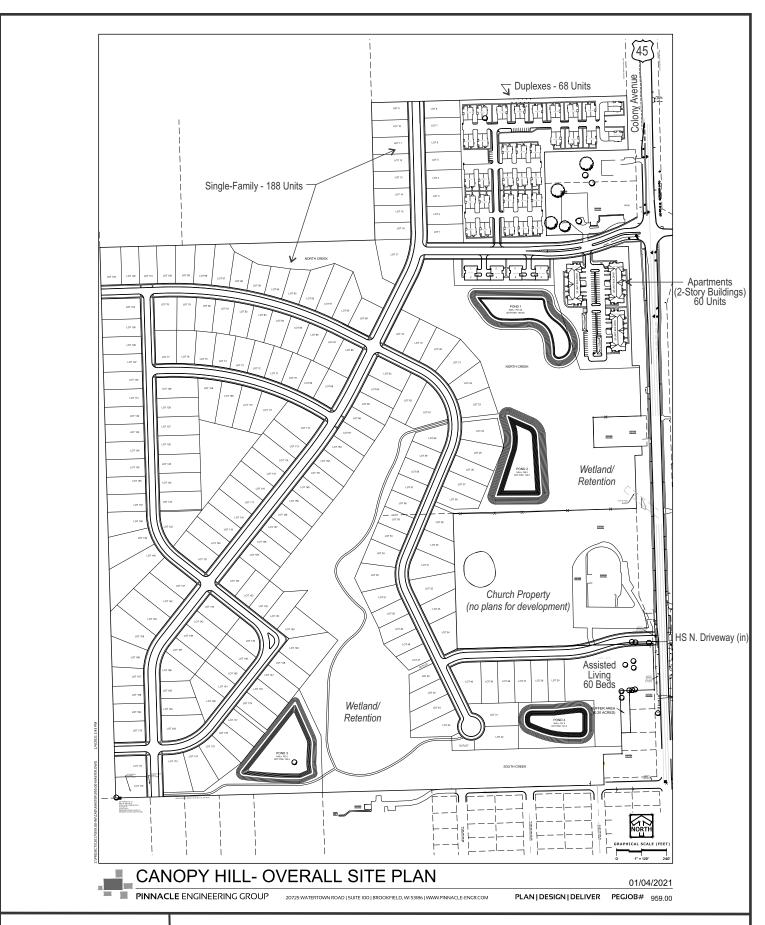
CONCEPTUAL SITE PLAN
